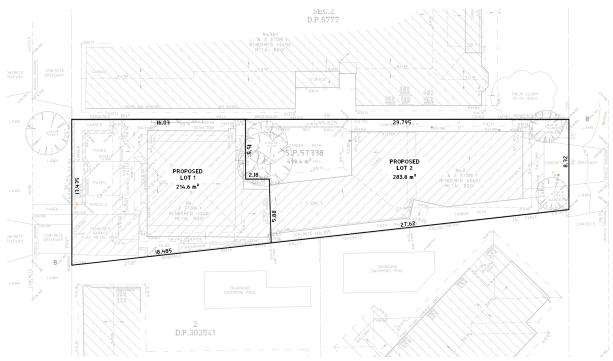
Proposed subdivision plan showing the extent of the contravention to the minimum lot size control. Source: APW Designs
